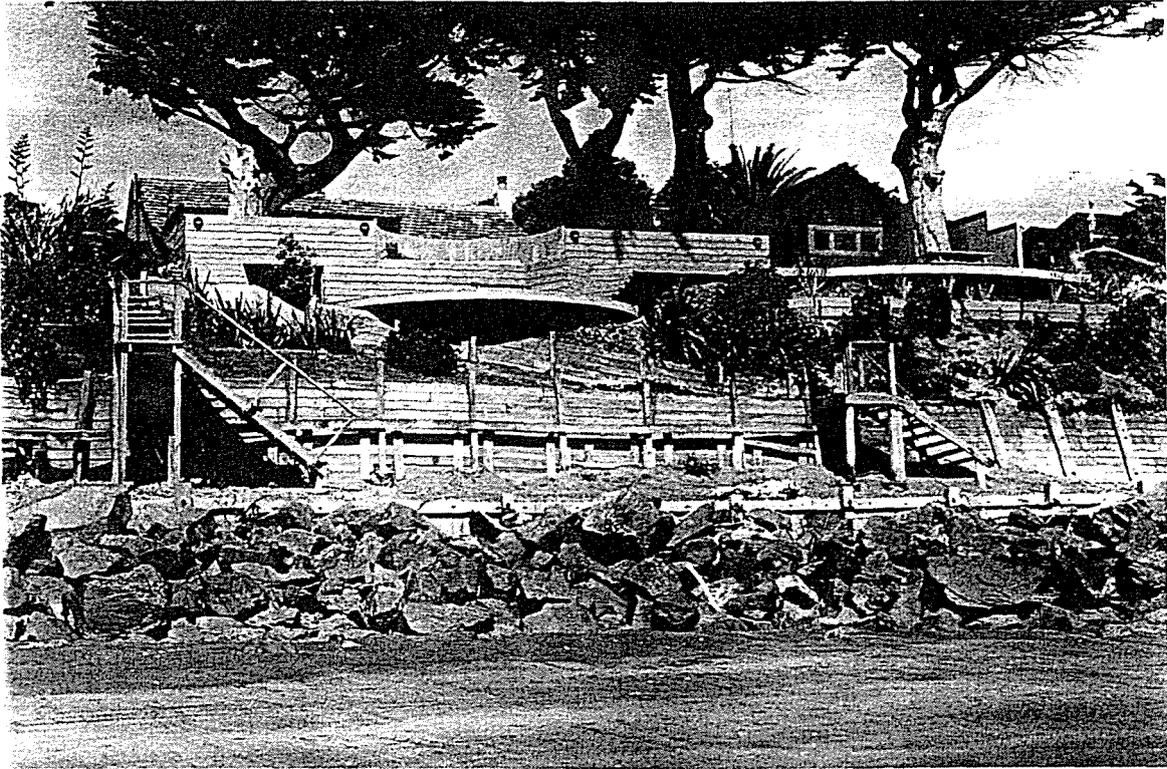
Raumati Beach. Endwall Erosion effects. Wall built to protect residential area. In turn creates adverse effects on QEII Park Coastal Walkway.
